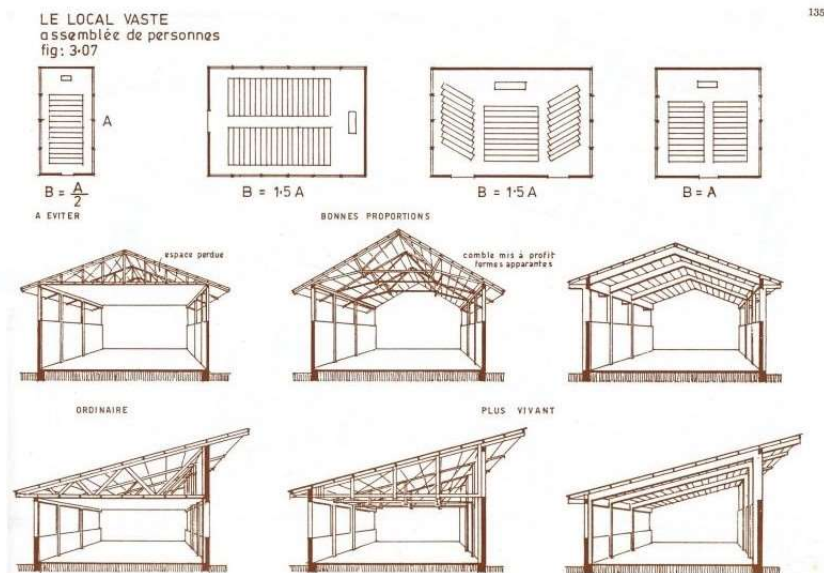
ADVANTAGE OF THE TRUSS WITHOUT CEILING. PAUL DEQUEKER BELIEVES THAT IN THE TROPICS THE ROOF SPACE SHOULD BE EXPLOITED BY USING EXPOSED TRUSSES, SOURCE, TROPICAL ARCHITECTURE
